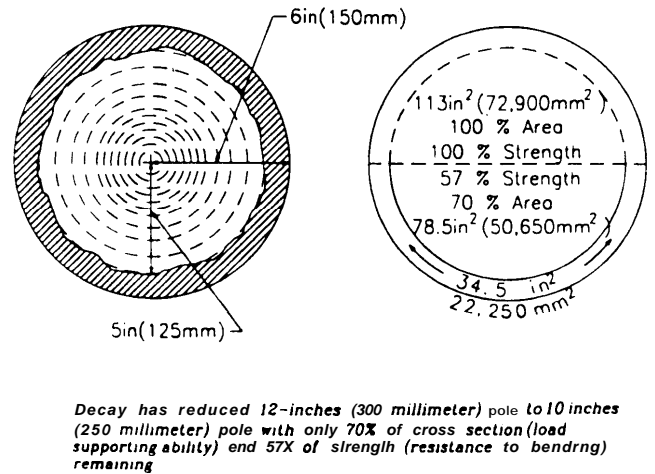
Twelve-inch (300-millimeter) pole with 1-inch (25-millimeter) surface decay
